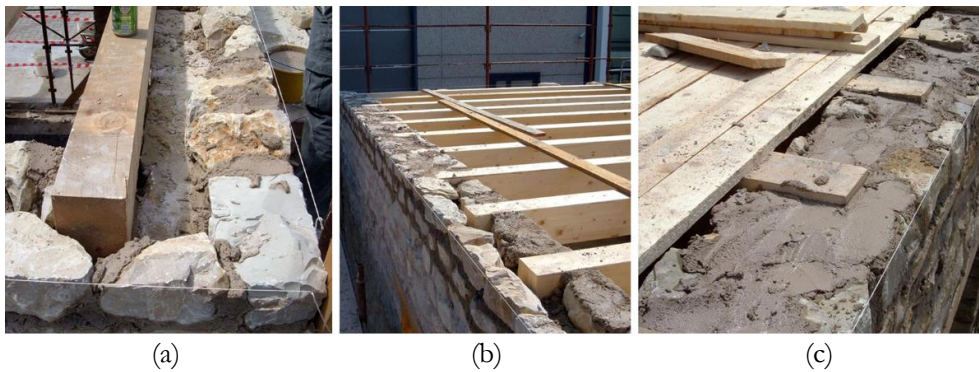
Timber floor: (a) and (b) floor joist supported by the internal wall leaf, (c) timber planks nailed to the floor joists.
